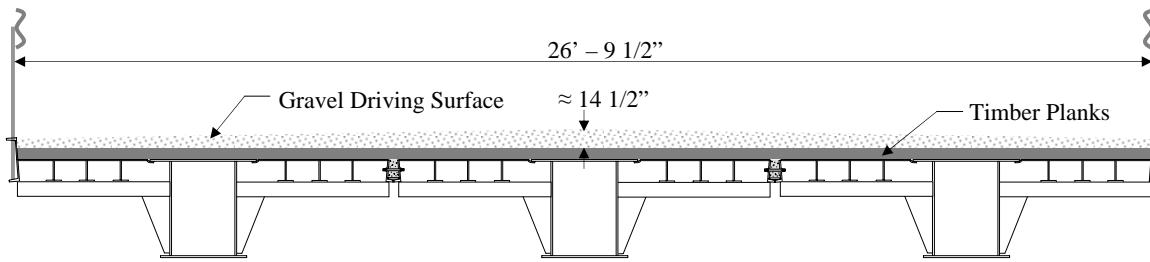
Cross-section of the Winnebago County Bridge [adapted from Wipf et al., 2003].
